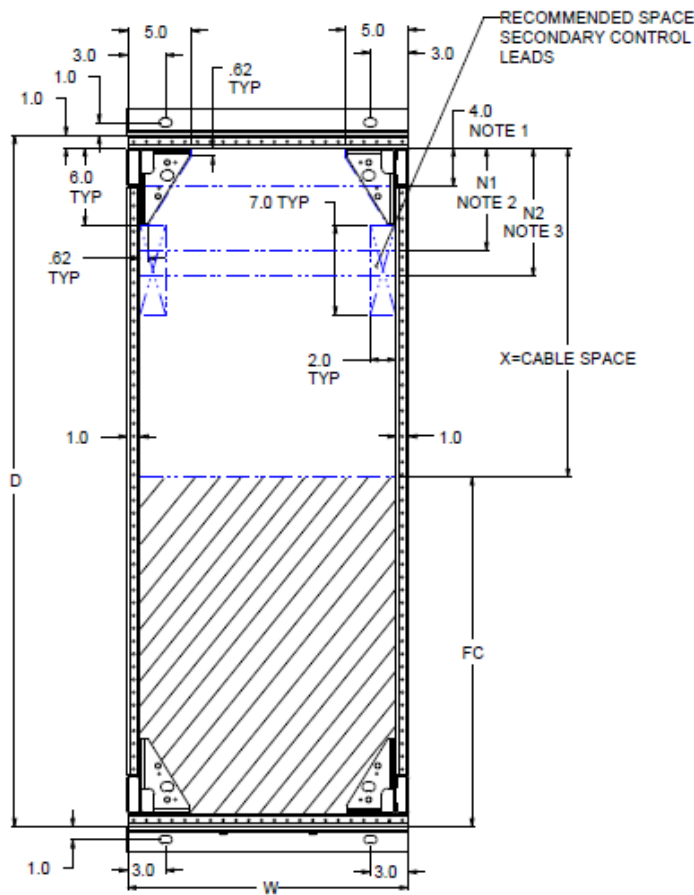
Indoor enclosure floor plan and cable entry space (inches)
